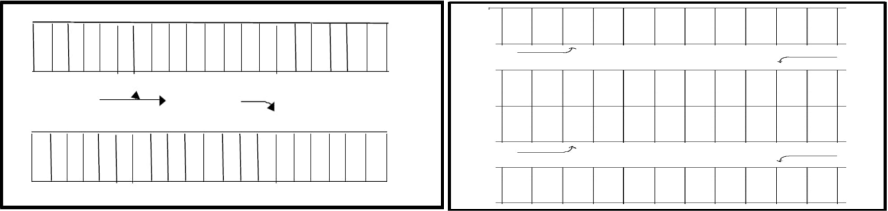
Single-sided parking pattern shape (perpendicular (90°, 45°, 60°)) [7]
